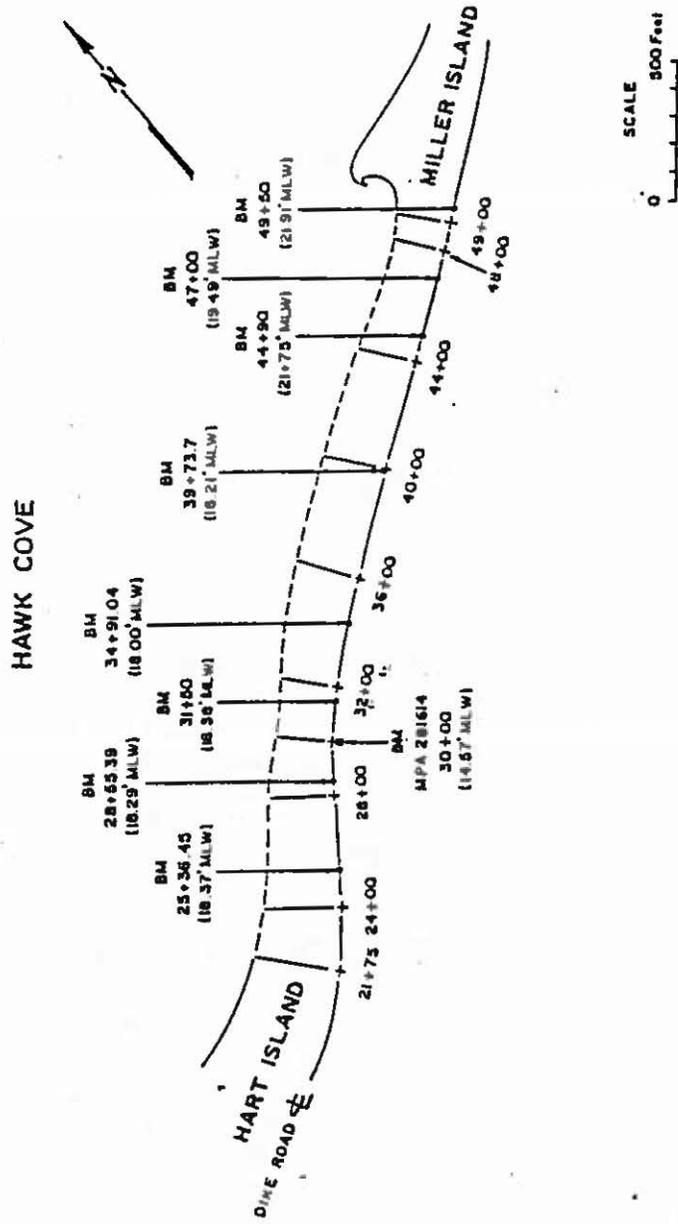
Dike location of the surveyed profile lines and bench marks.
